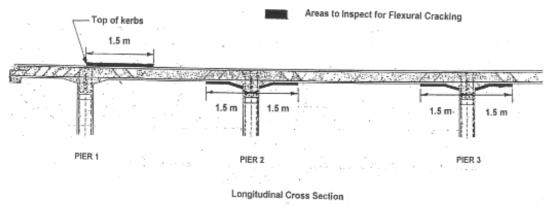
Flat Slab Bridge inspection areas
